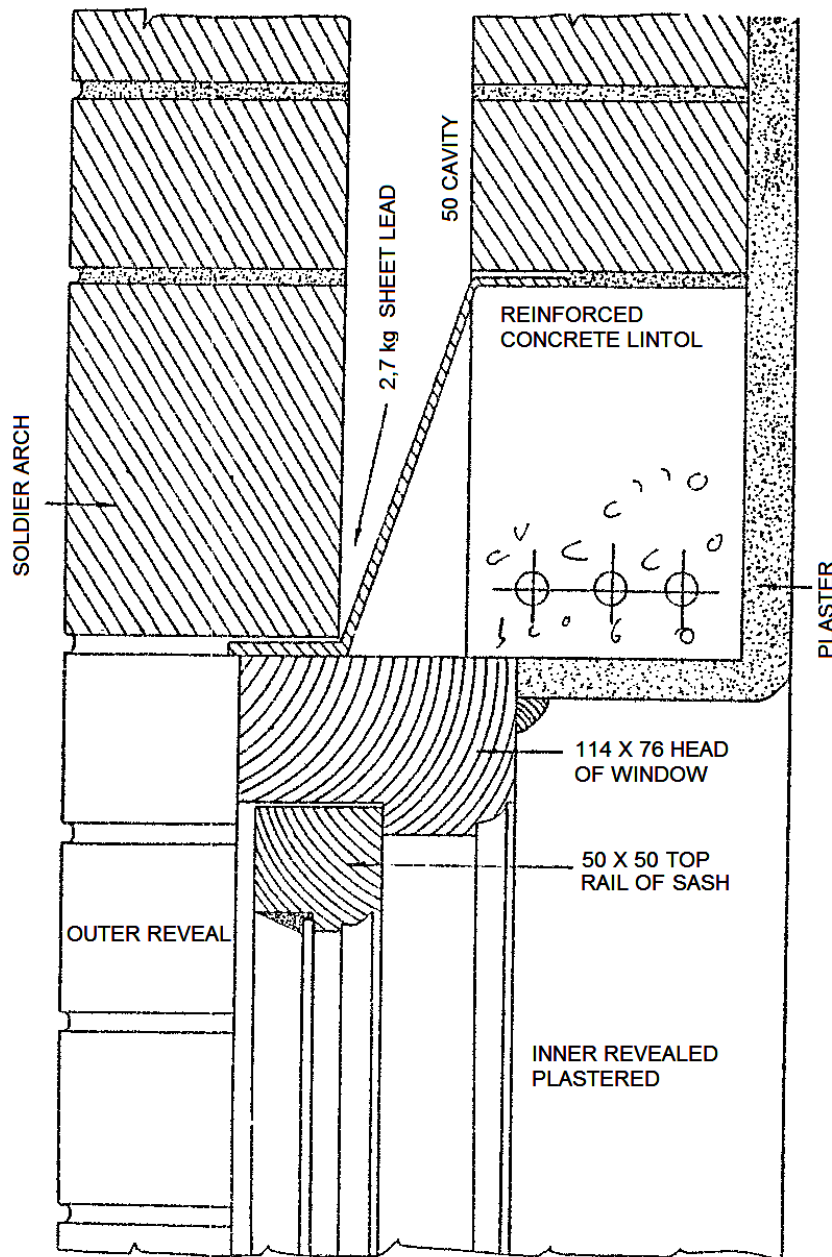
Section through 280 mm cavity wall showing treatment at head window
